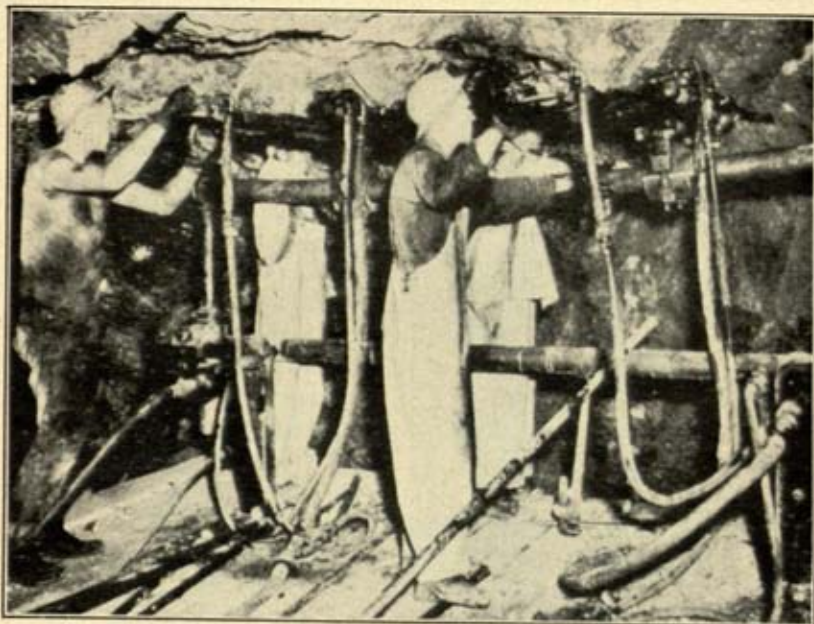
Drifters used to drill horizontal holes. (*Western Construction.*)
